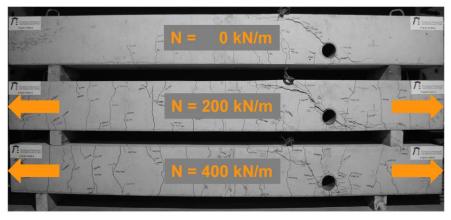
Schematic representation of the longitudinal tensile forces in the test stand for a test series of reinforced concrete specimens with cavities.
